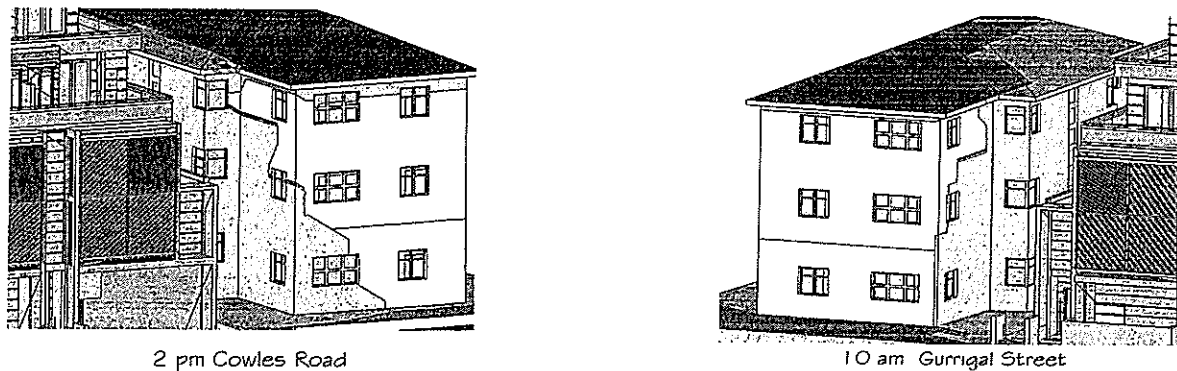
This figure shows shadowing at 10am and 2pm at mid winter from the proposed building to the residential flat building adjoining to the south at 87A Cowles Road. The diagram also illustrates the small setback and height of the proposal to this building with the full extent of the height of the upper levels cut out of this diagram.
